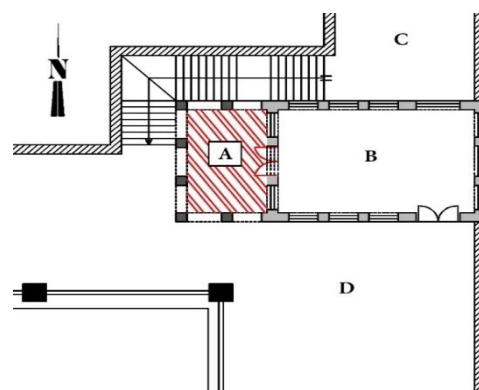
Space occupied by shade on the floor (part A) and in view (part B). Source: authors' elaboration
